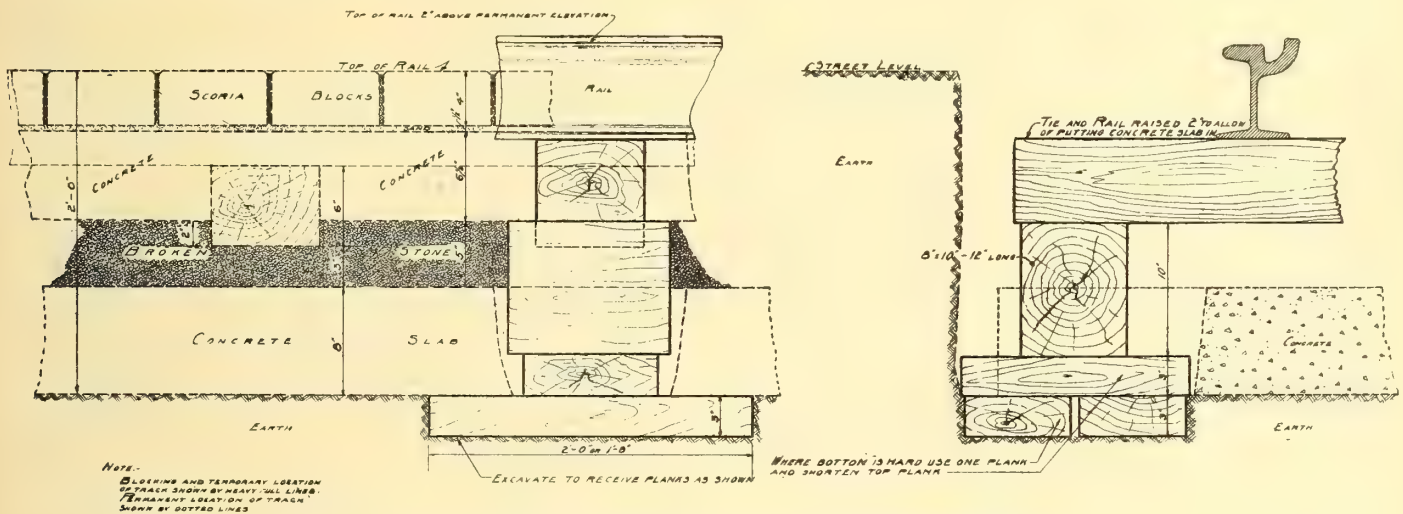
Showing plan of blocking up rails so concrete slab can be laid
